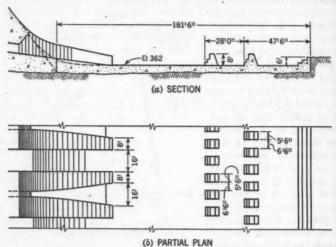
General Layout of Stilling Basin, Norfork Dam
